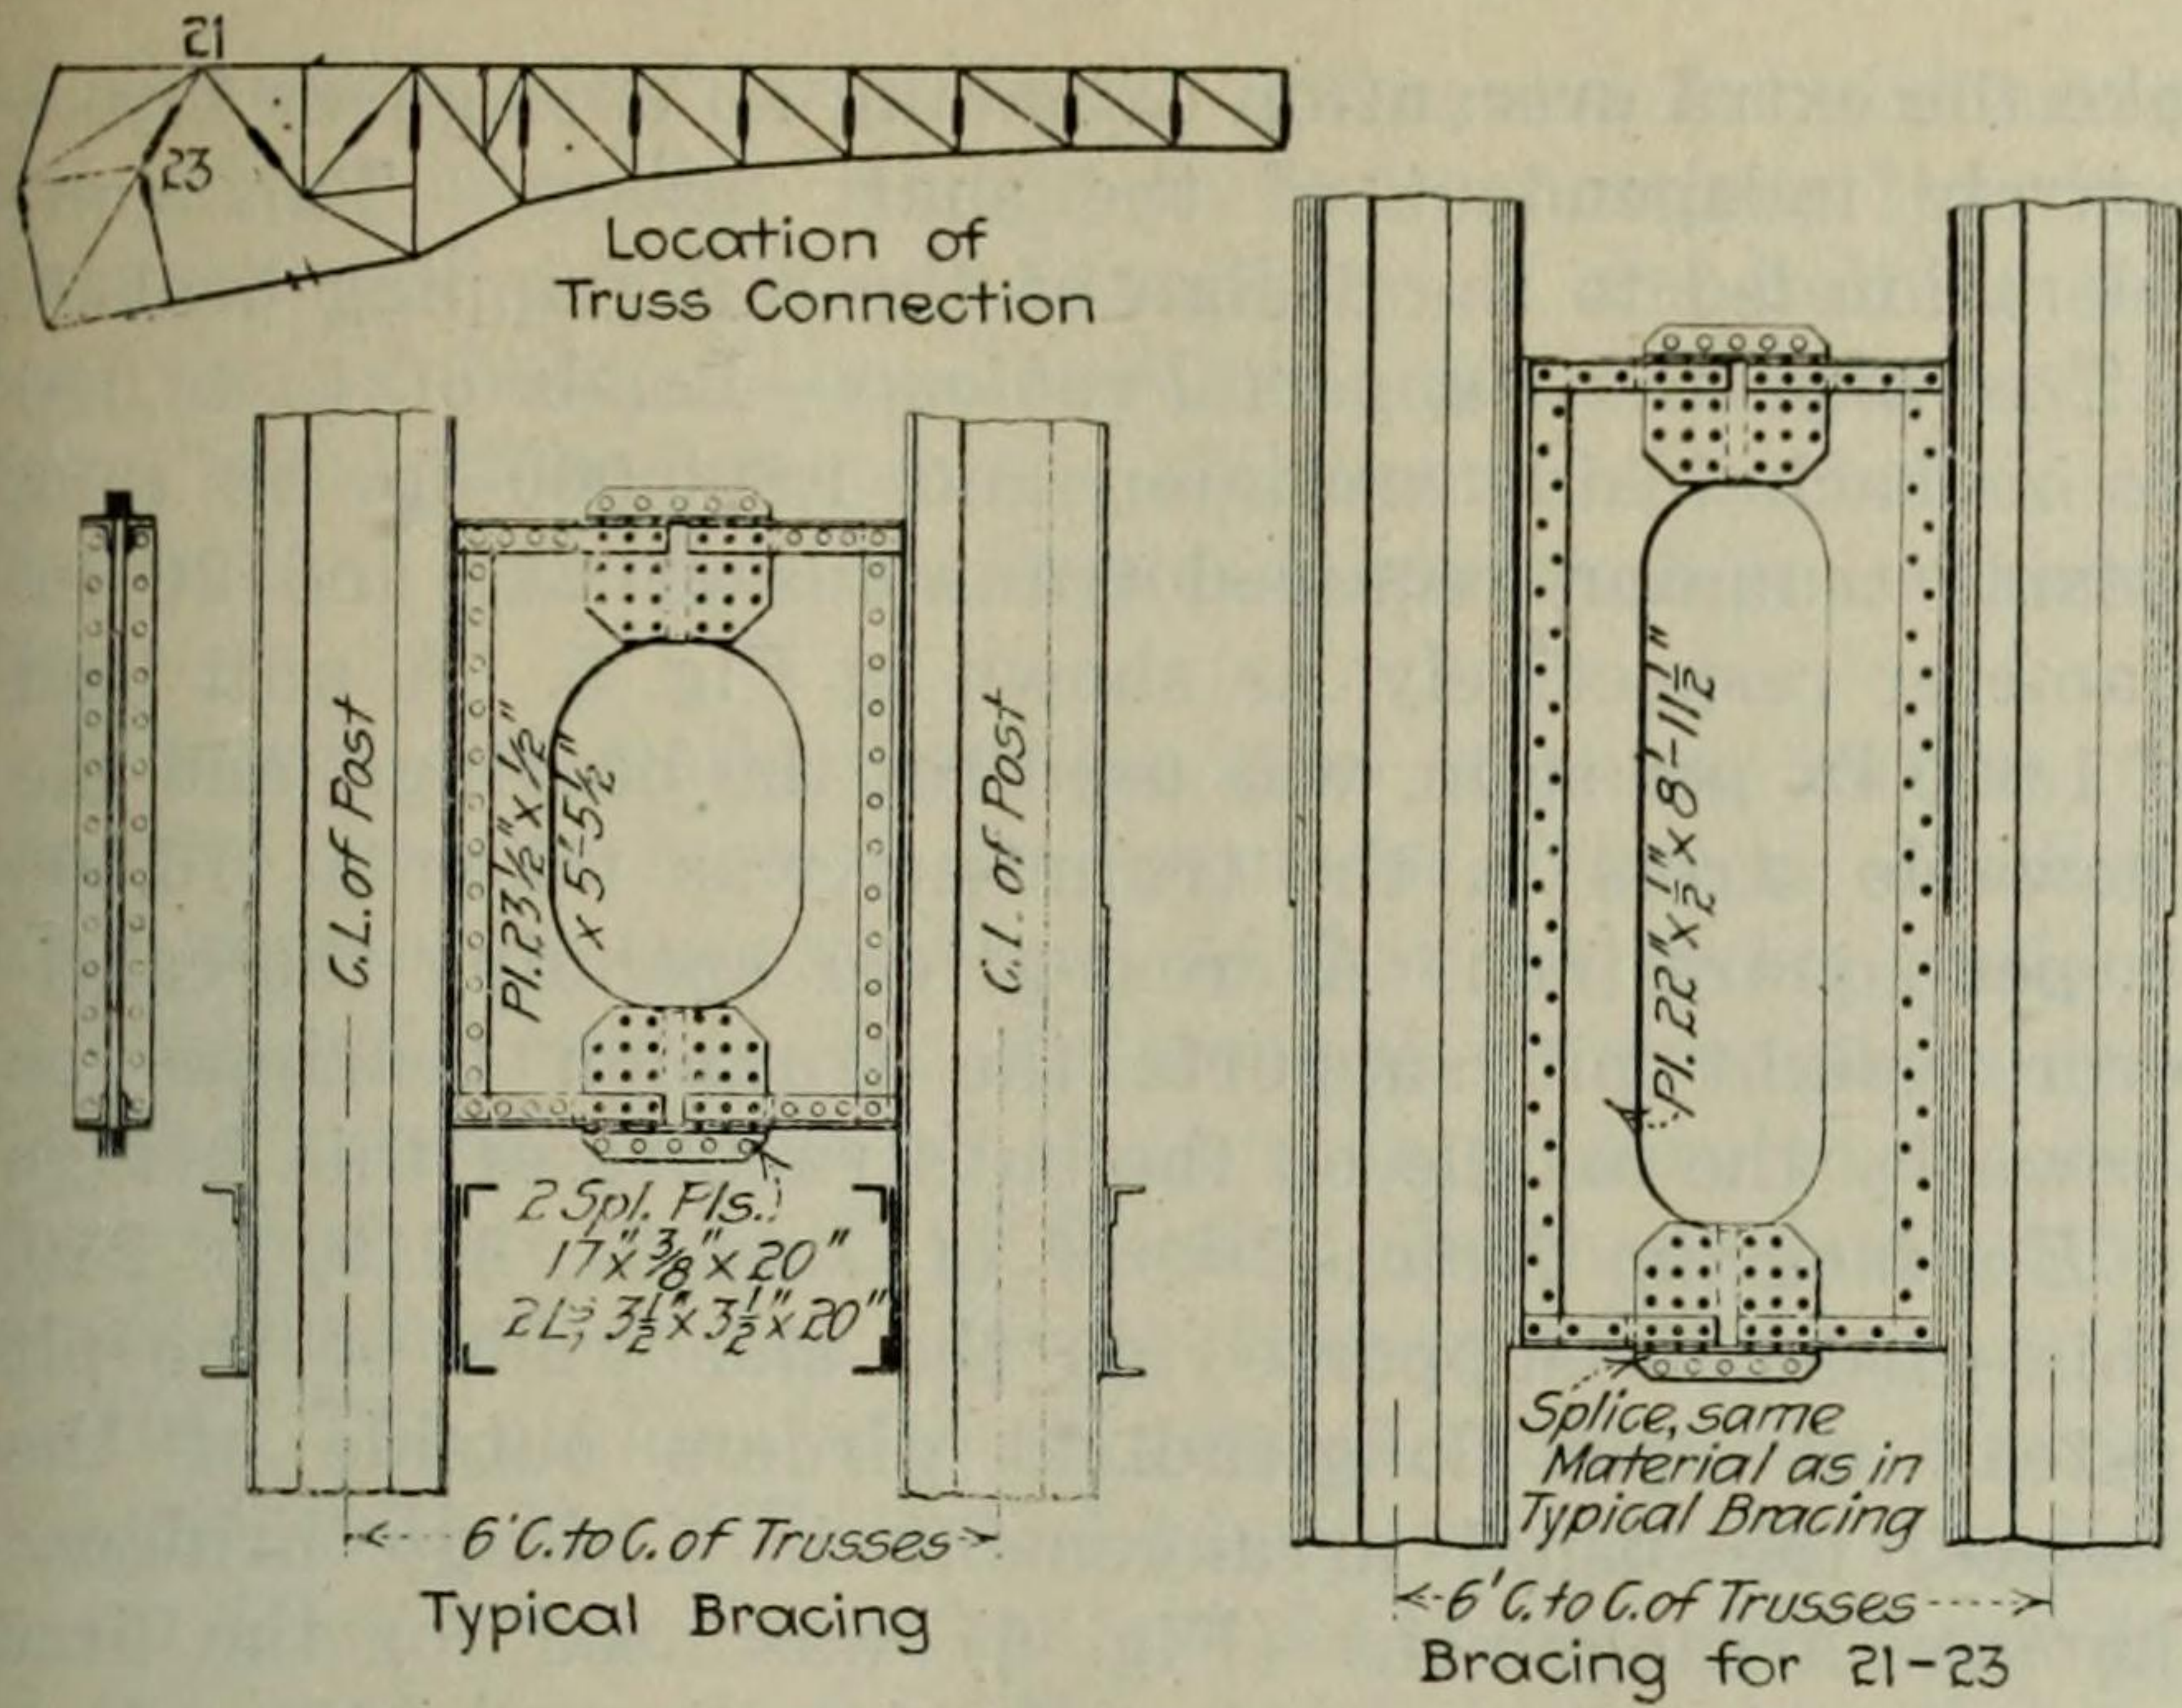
SEPARABLE DIAPHRAGMS CONNECT INNER TRUSSES OF FOUR-TRUSS BRIDGE
